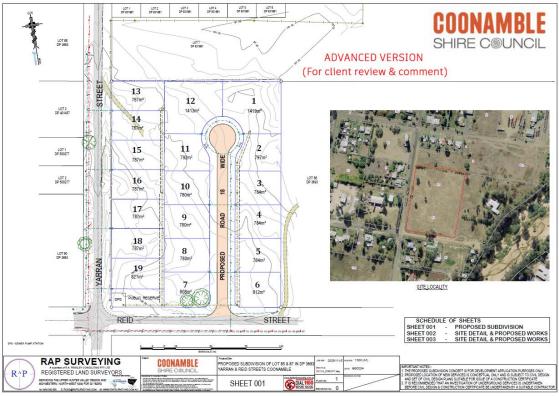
Proposed Subdivision Plan (Source: RAP Surveying)
